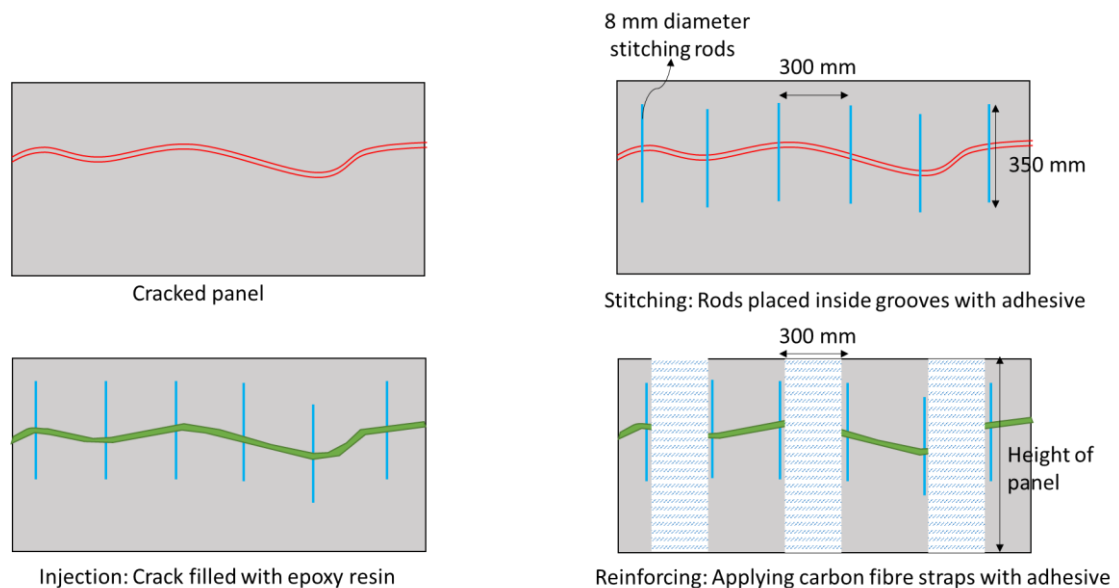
Repair methodology of cracked concrete panels (not to scale)
